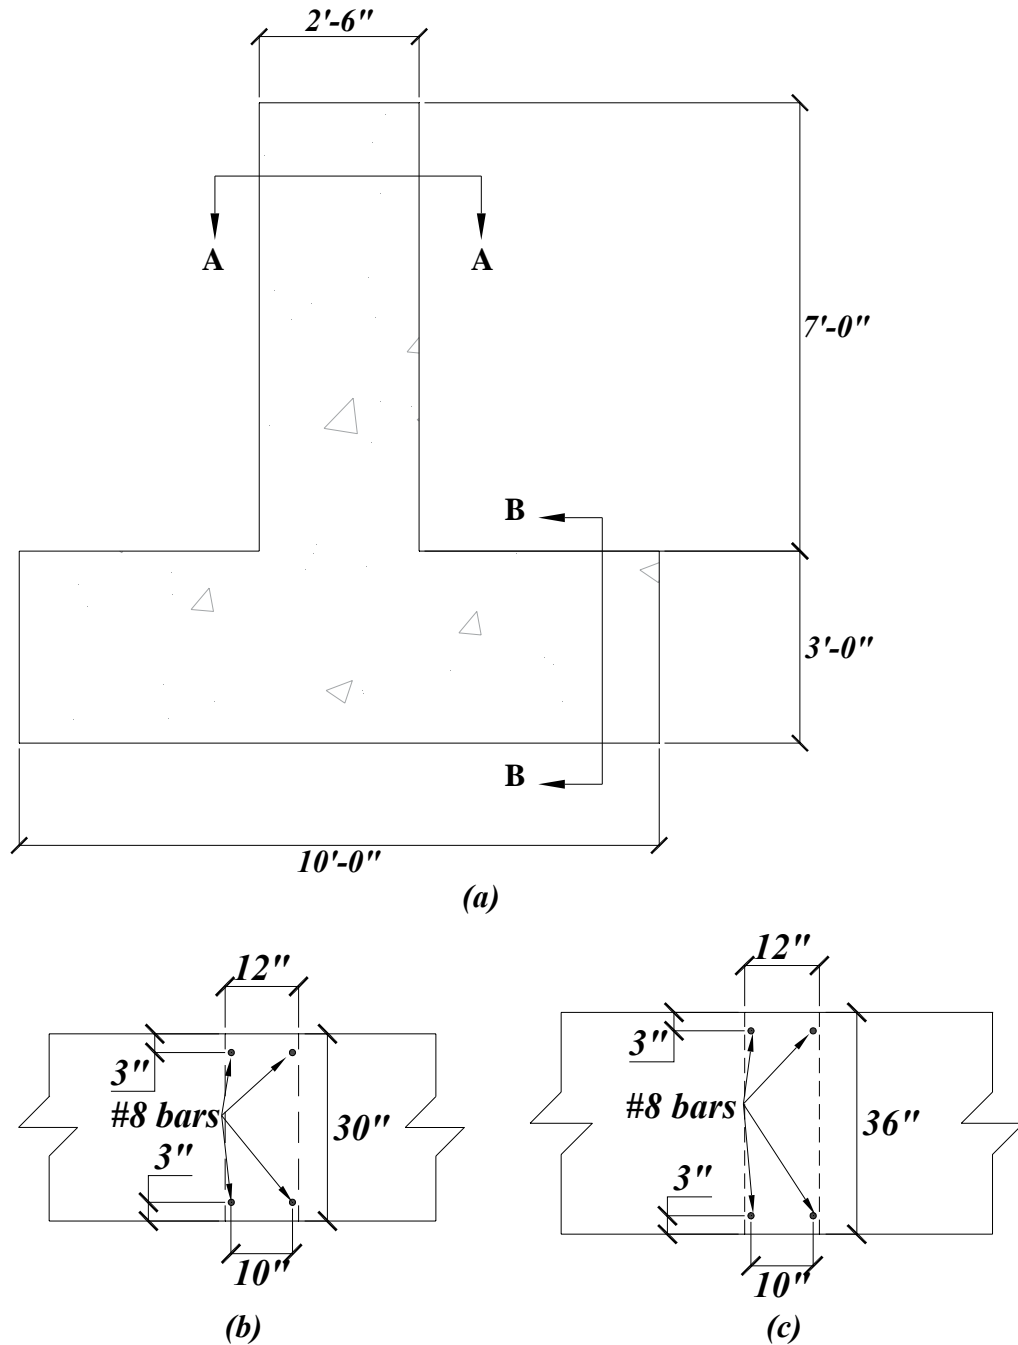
a) Cross-sectional view; b) Cut A-A through stem wall per foot; and c) cut B-B through footing per foot
